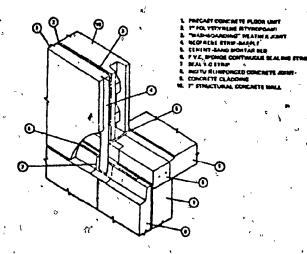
Precast Concrete Weathering Joint (Ref. 31)
